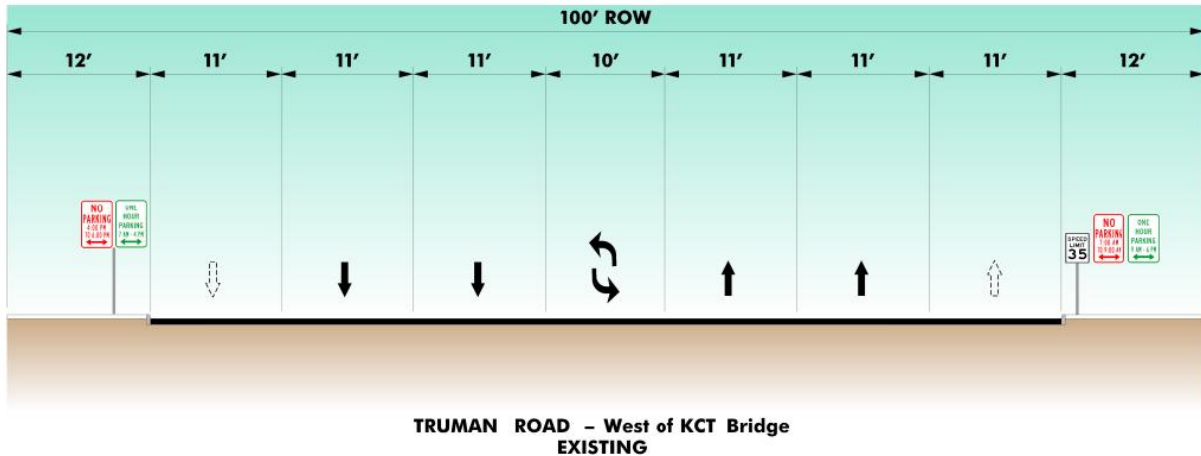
Enhanced Streetcar Typical Section - Truman Road, West of KCT Bridge, Existing Conditions
